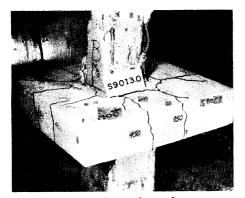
Typical cracking for interior column specimens, Type I (slab series)
